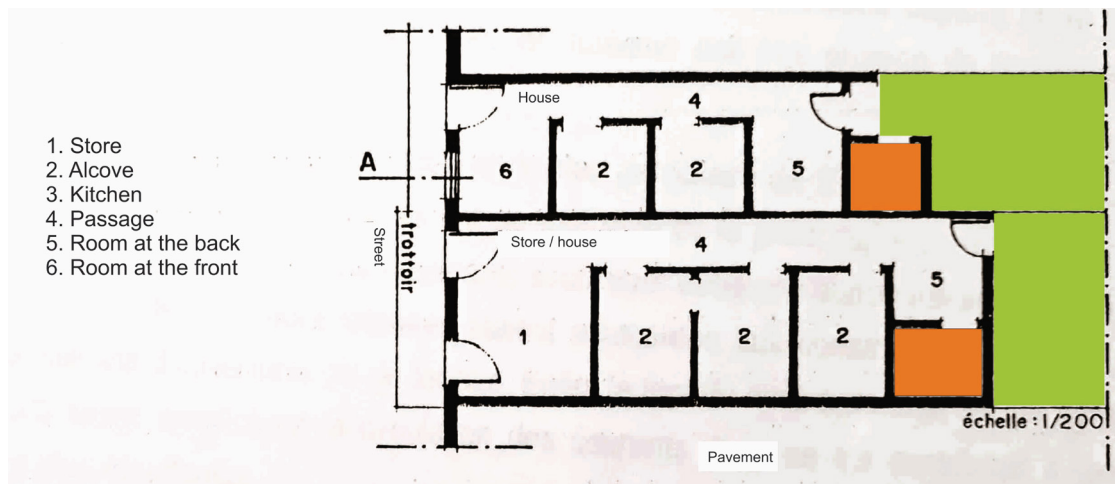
Ground plan of the floor of a detached building with a backgarden in Maceió
